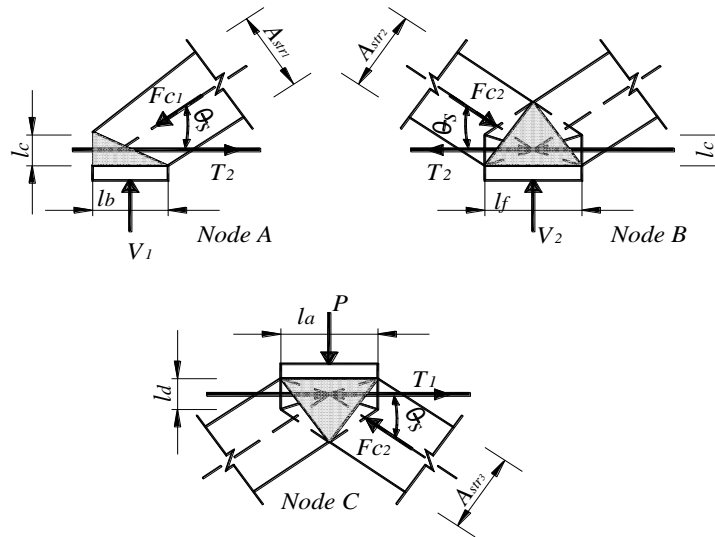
Details of Nodal Zones in Continuous Deep Beams
